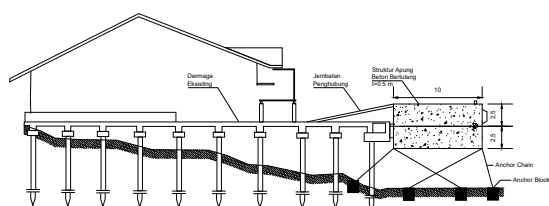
Alternative 2 (new construction of floating structure in front of the existing pier).
